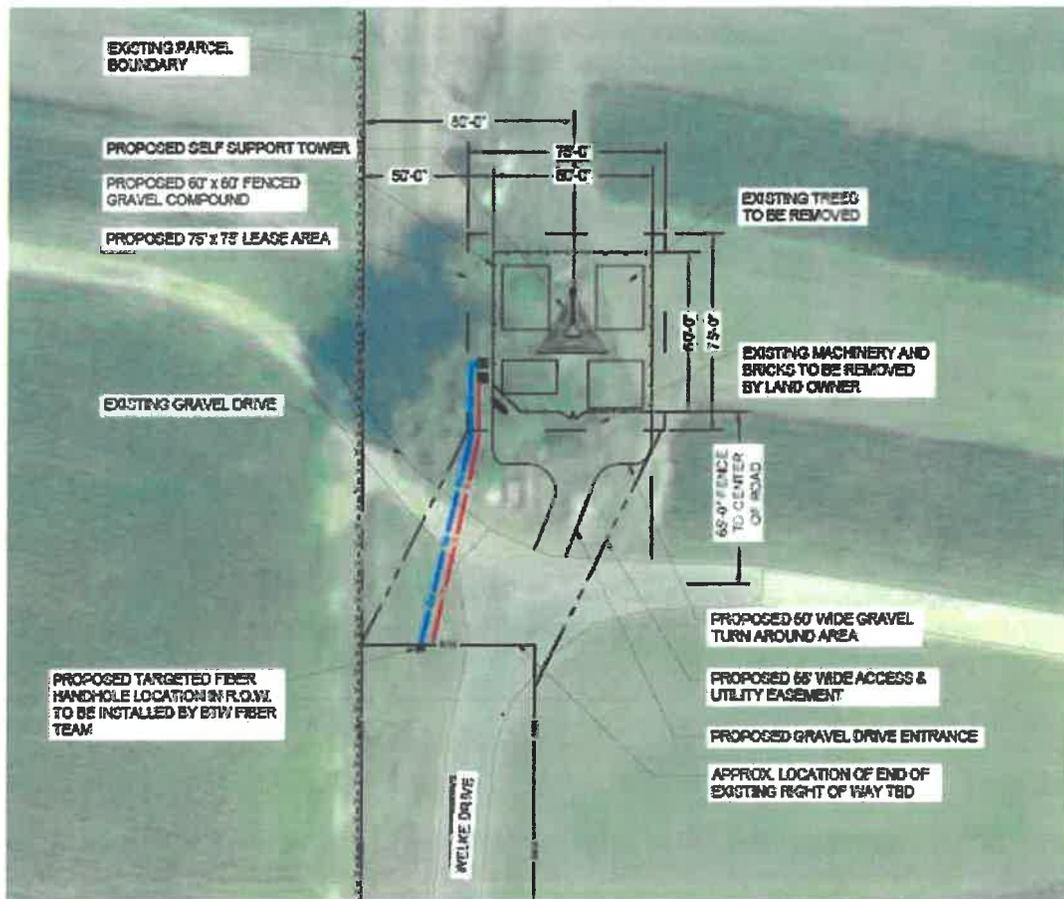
Site plan for the proposed self-support tower site off Welke Drive.
